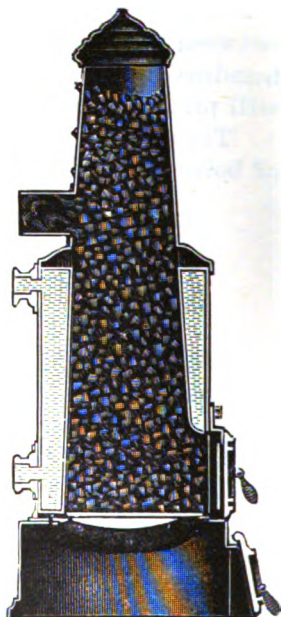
Lumby's Independent Cylindrical Boiler.
